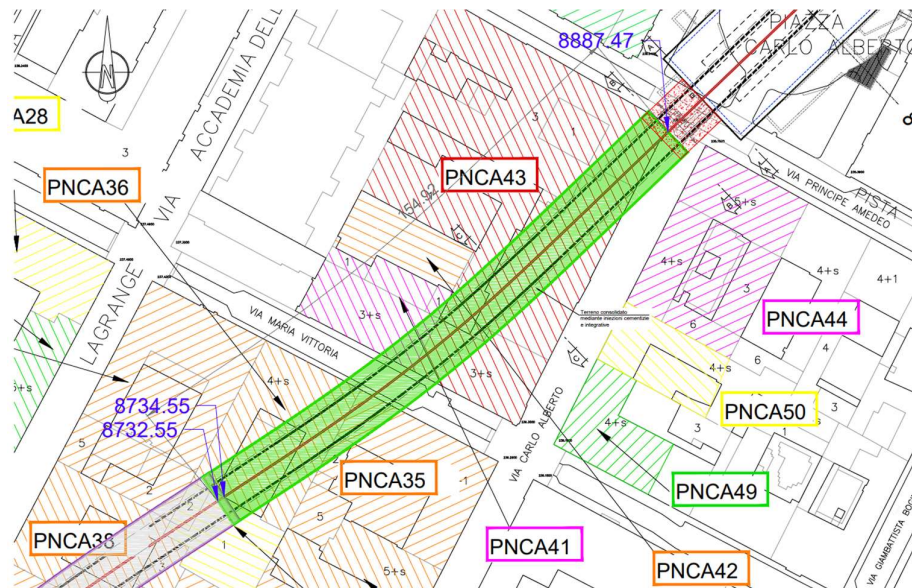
Planimetry of the jet grouting injections (Infratrasporti.To S.r.l., 2024)
